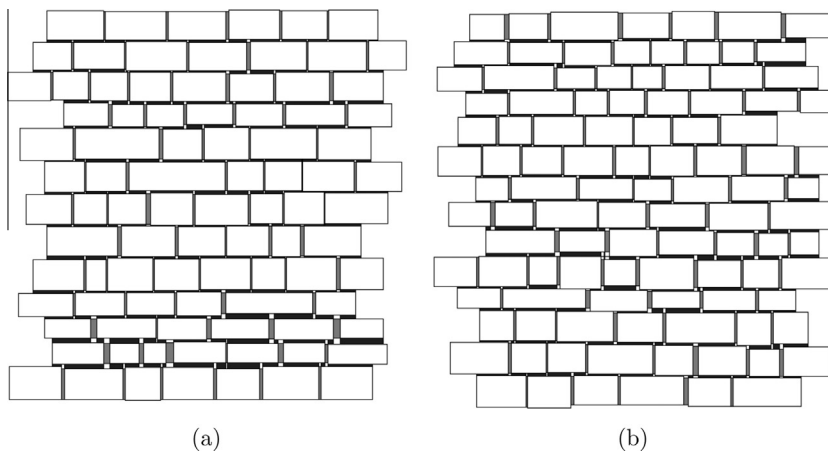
Image of the wall with equivalent rectangular stones and bed (dark gray) and head (light gray) mortar joint: (a) masonry wall #1, (b) masonry wall #2.
